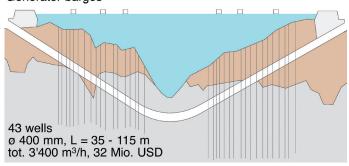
Storebælt tunnel. Large scale pore water pressure relief below the seabed using pumping wells [1]
